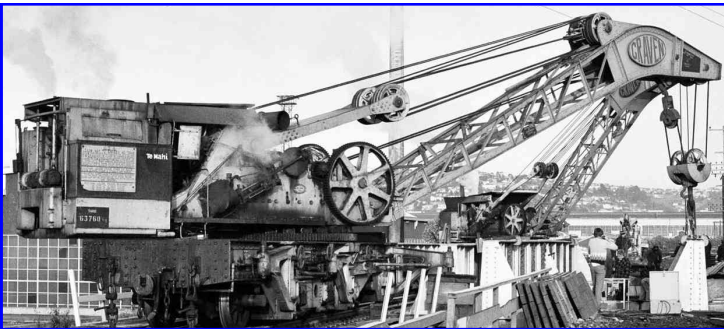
Two NZR Craven 40T cranes replacing a bridge girder in Auckland, NZ. (Photo: Ken Devlin).
